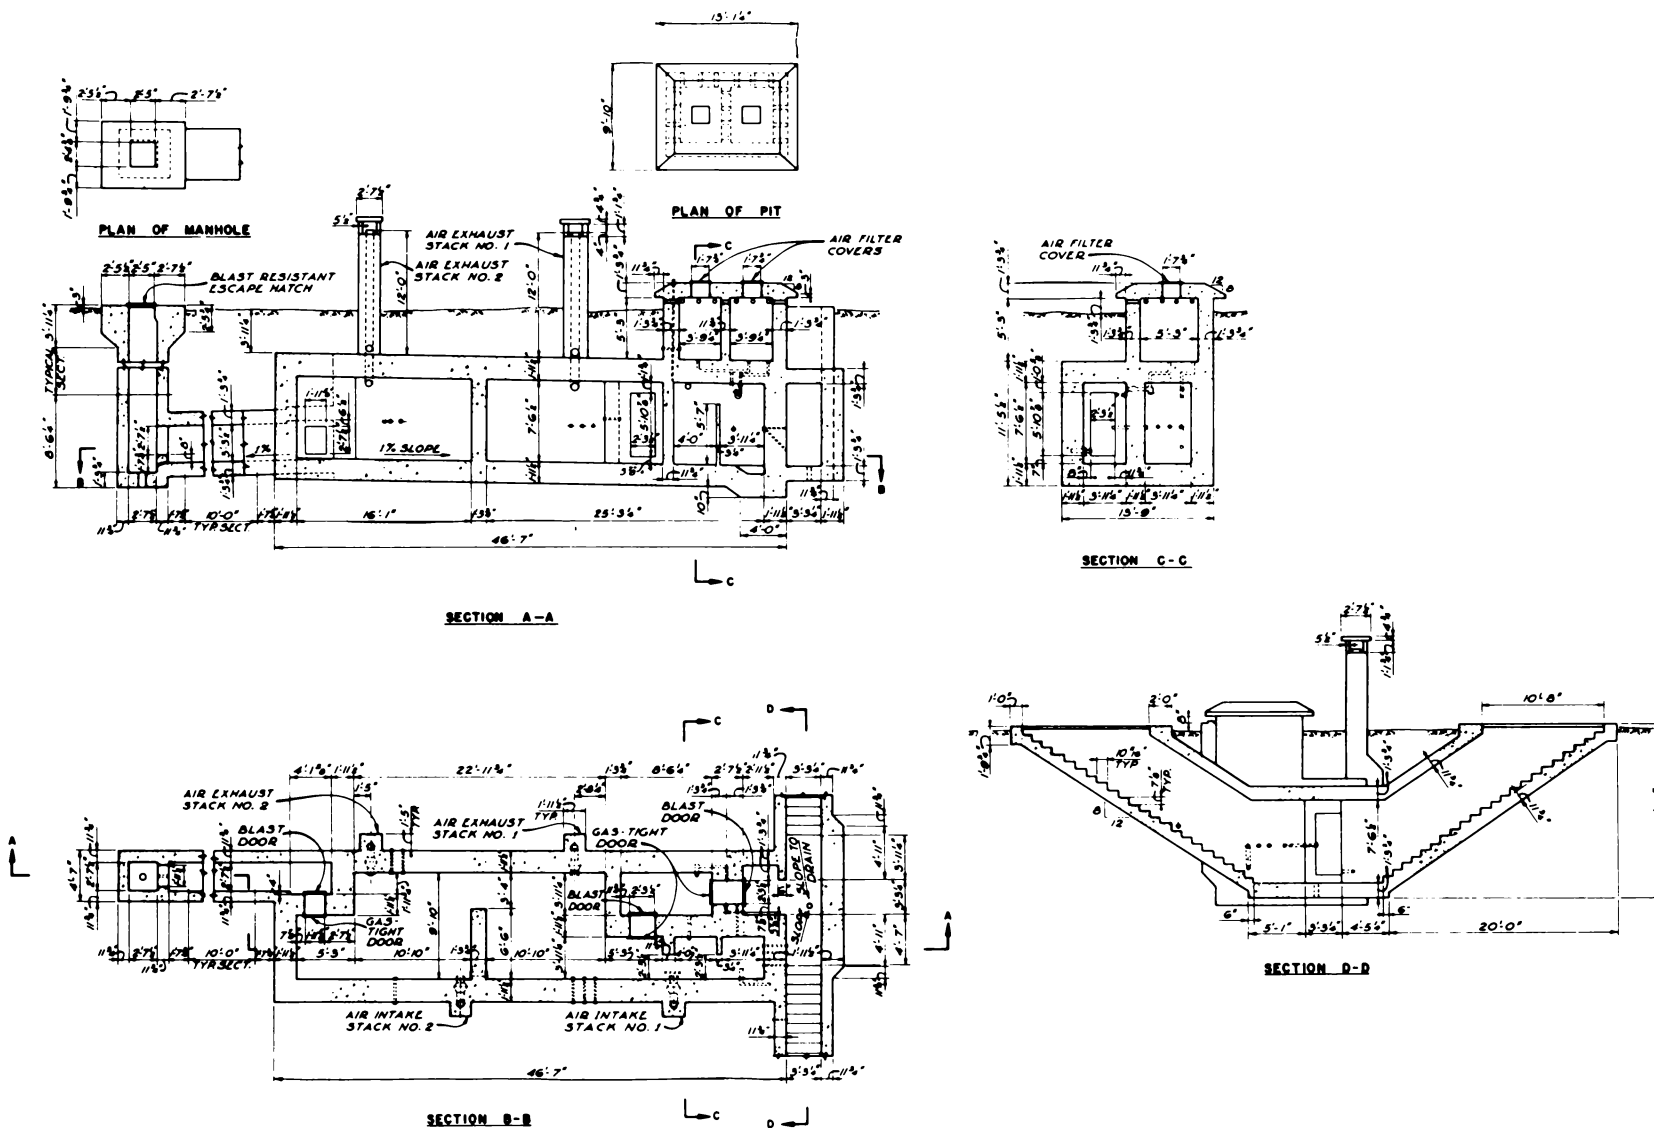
Rectangular shelter, type 60, structure II-1, architectural layout.
